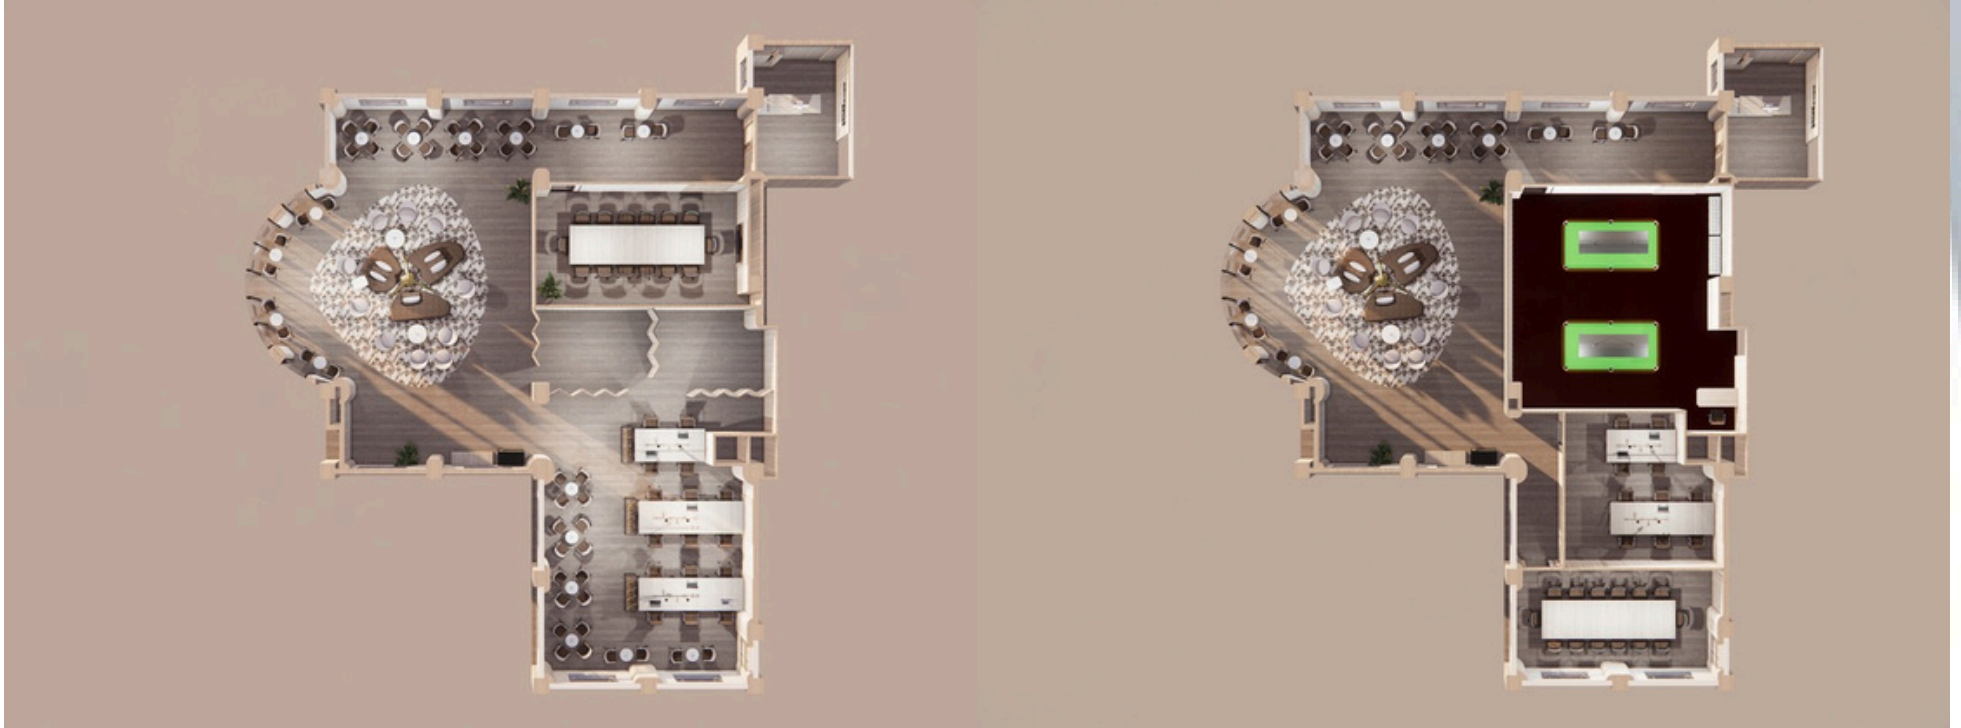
Level 2 Layout plan for Resolution 1a Figure 2.2: Level 2 Layout plan for Resolution 1b
